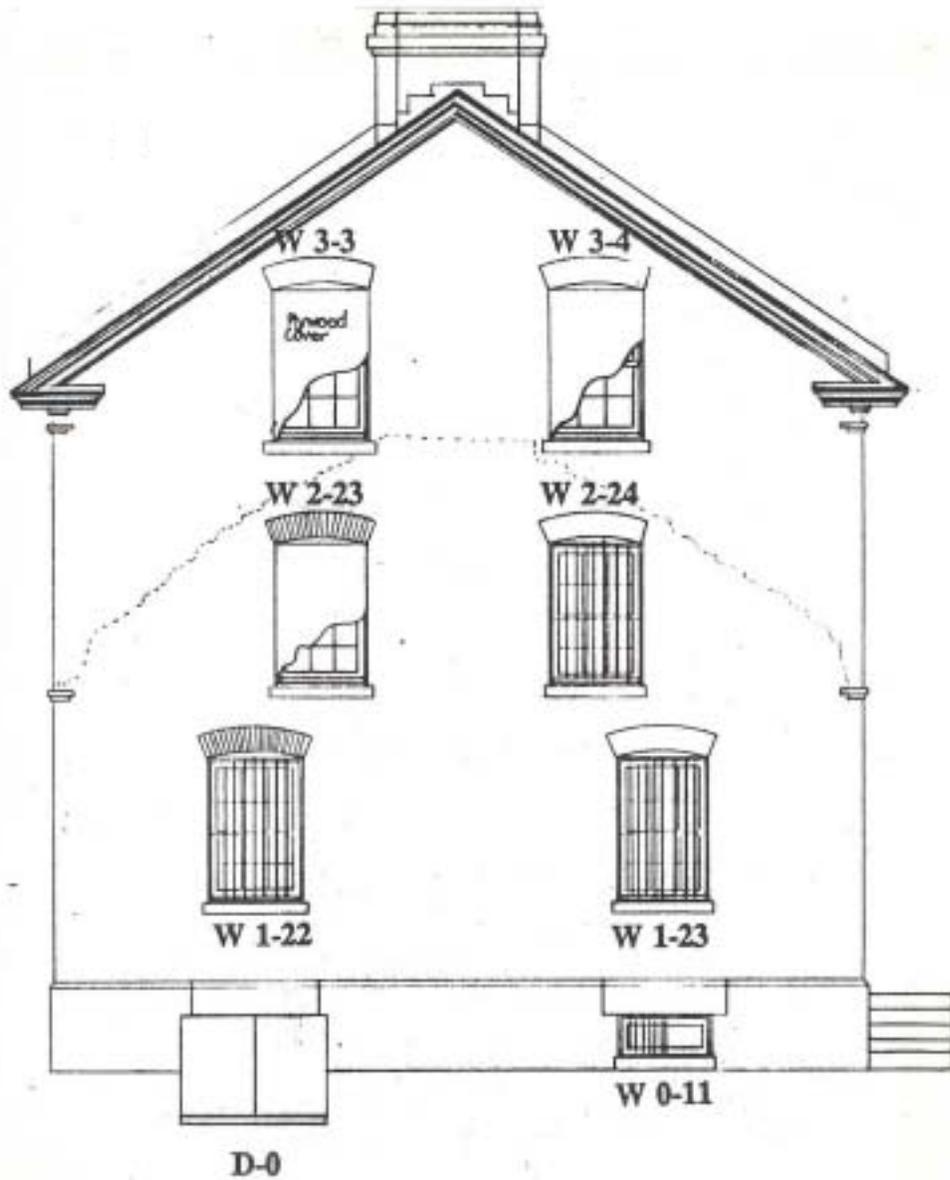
North elevation of Building 32, showing scheduled window assignments [1993].
